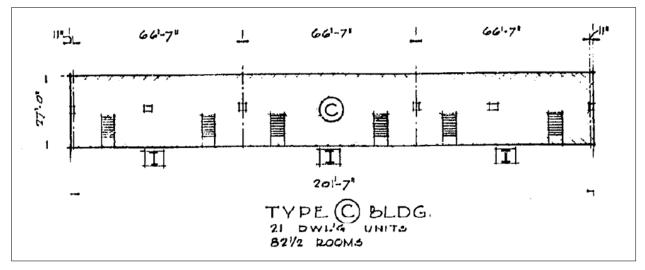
Type C Building as detailed on Iberville Site Plan. Note its configuration as multiple iterations of the Type A Building
